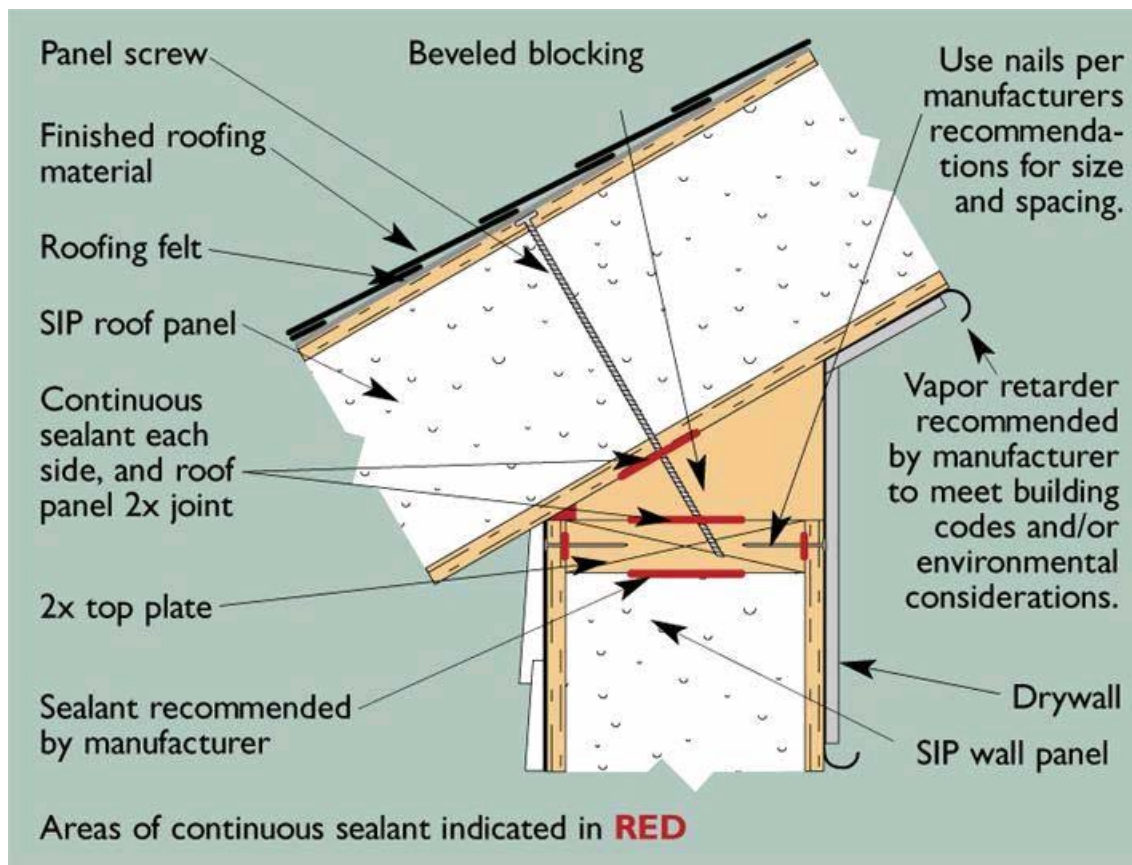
“Best Practice” Roof to Wall Detail, Building Science Corporation
